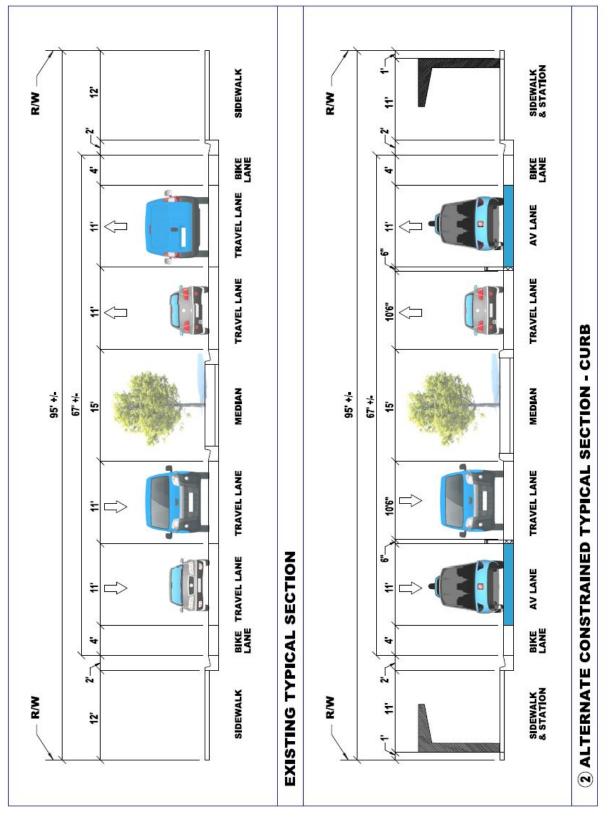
West Corridor Existing and Alternate Constrained Typical Section with Curbside Station - W. Riverside Avenue
